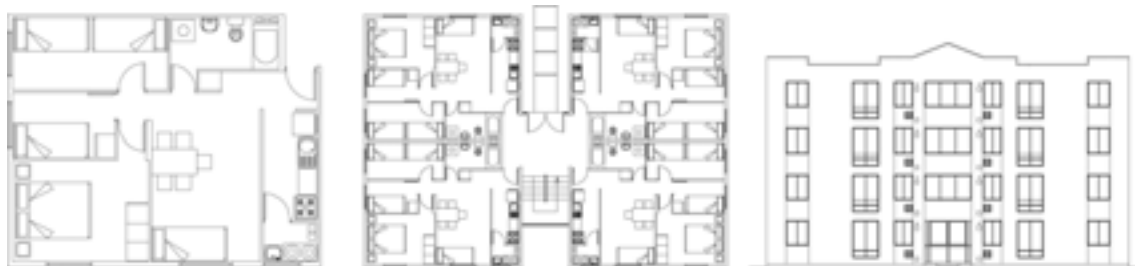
Apartment blocks built for the SDH2 housing development (from left to right: apartment layout, storey layout and frontal façade)
